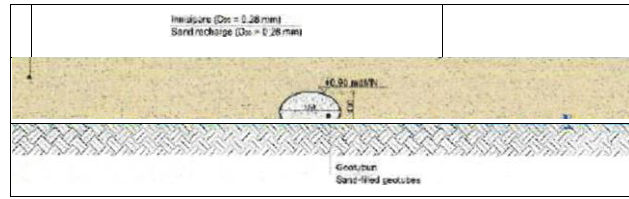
Geotubes filled with sand EIG - Type transversal section
